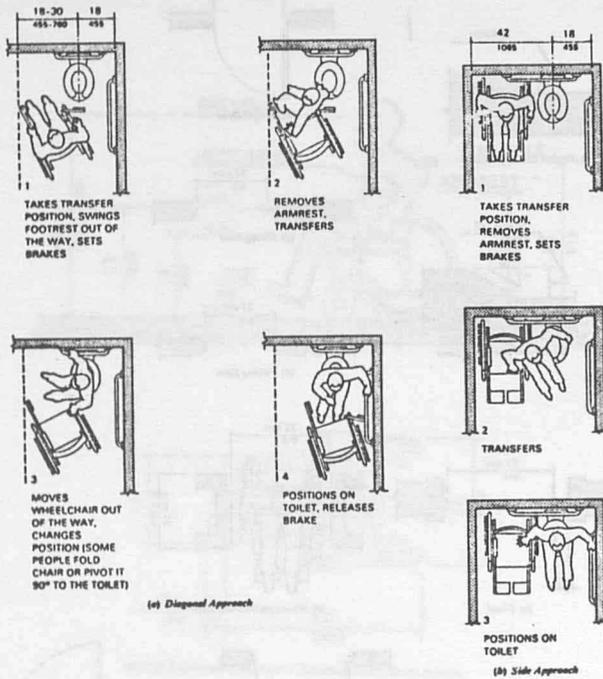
Toilet transfers. ANSI, American National Standard for Buildings and Facilities, 1986.
